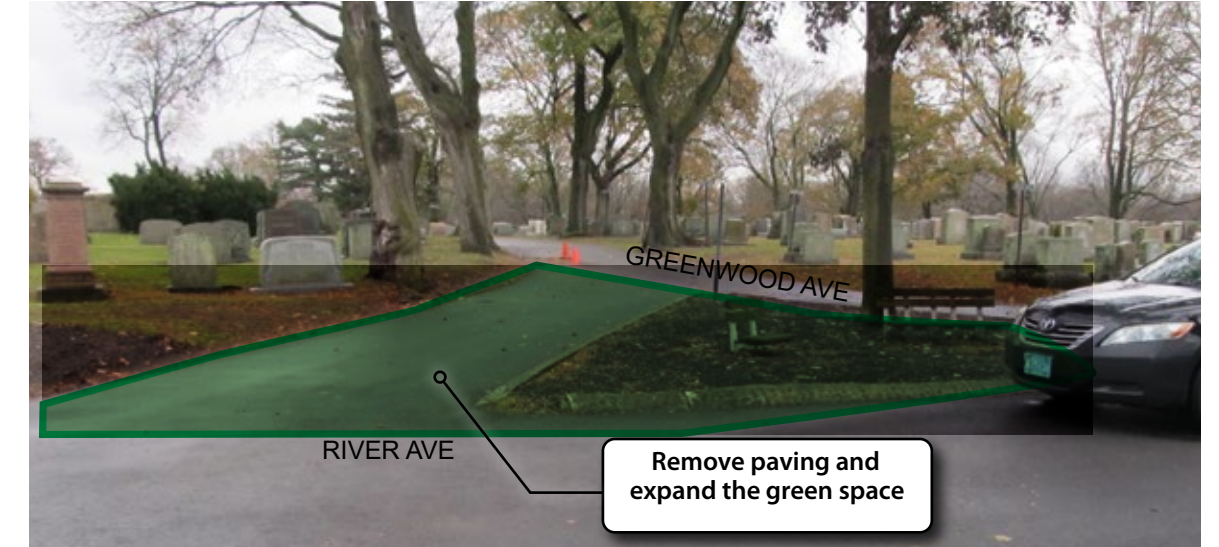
Diagram of pavement removal and green space expansion at Greenwood Avenue triangle.
